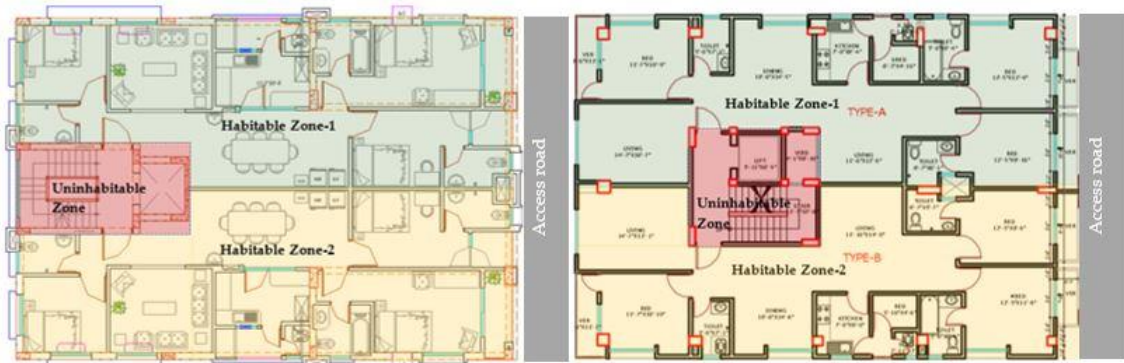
Typical Floor Plans with Double-unit Apartment (Type A). Source: Field Study
